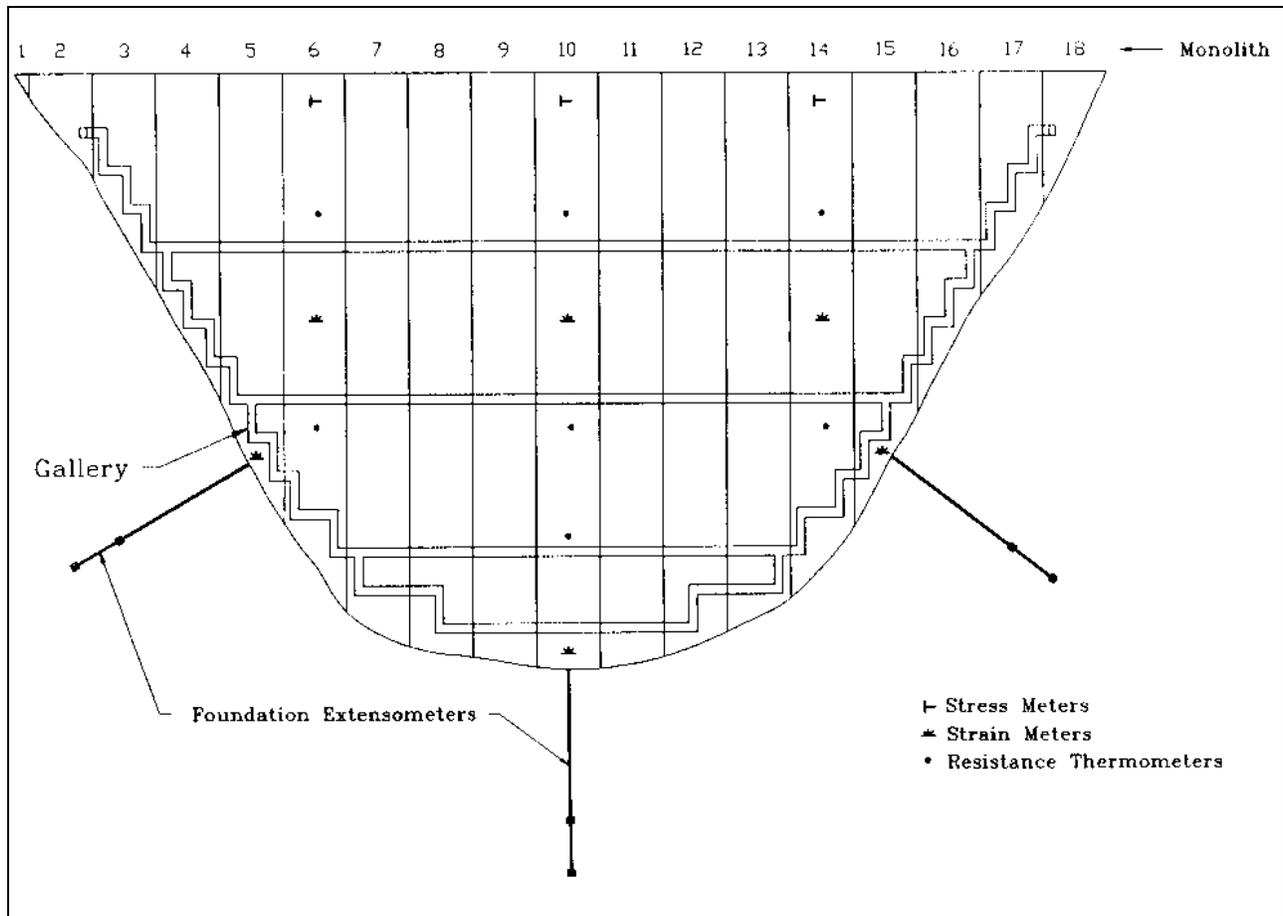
Recommended location of embedded instruments in arch dams (elevation looking upstream)
